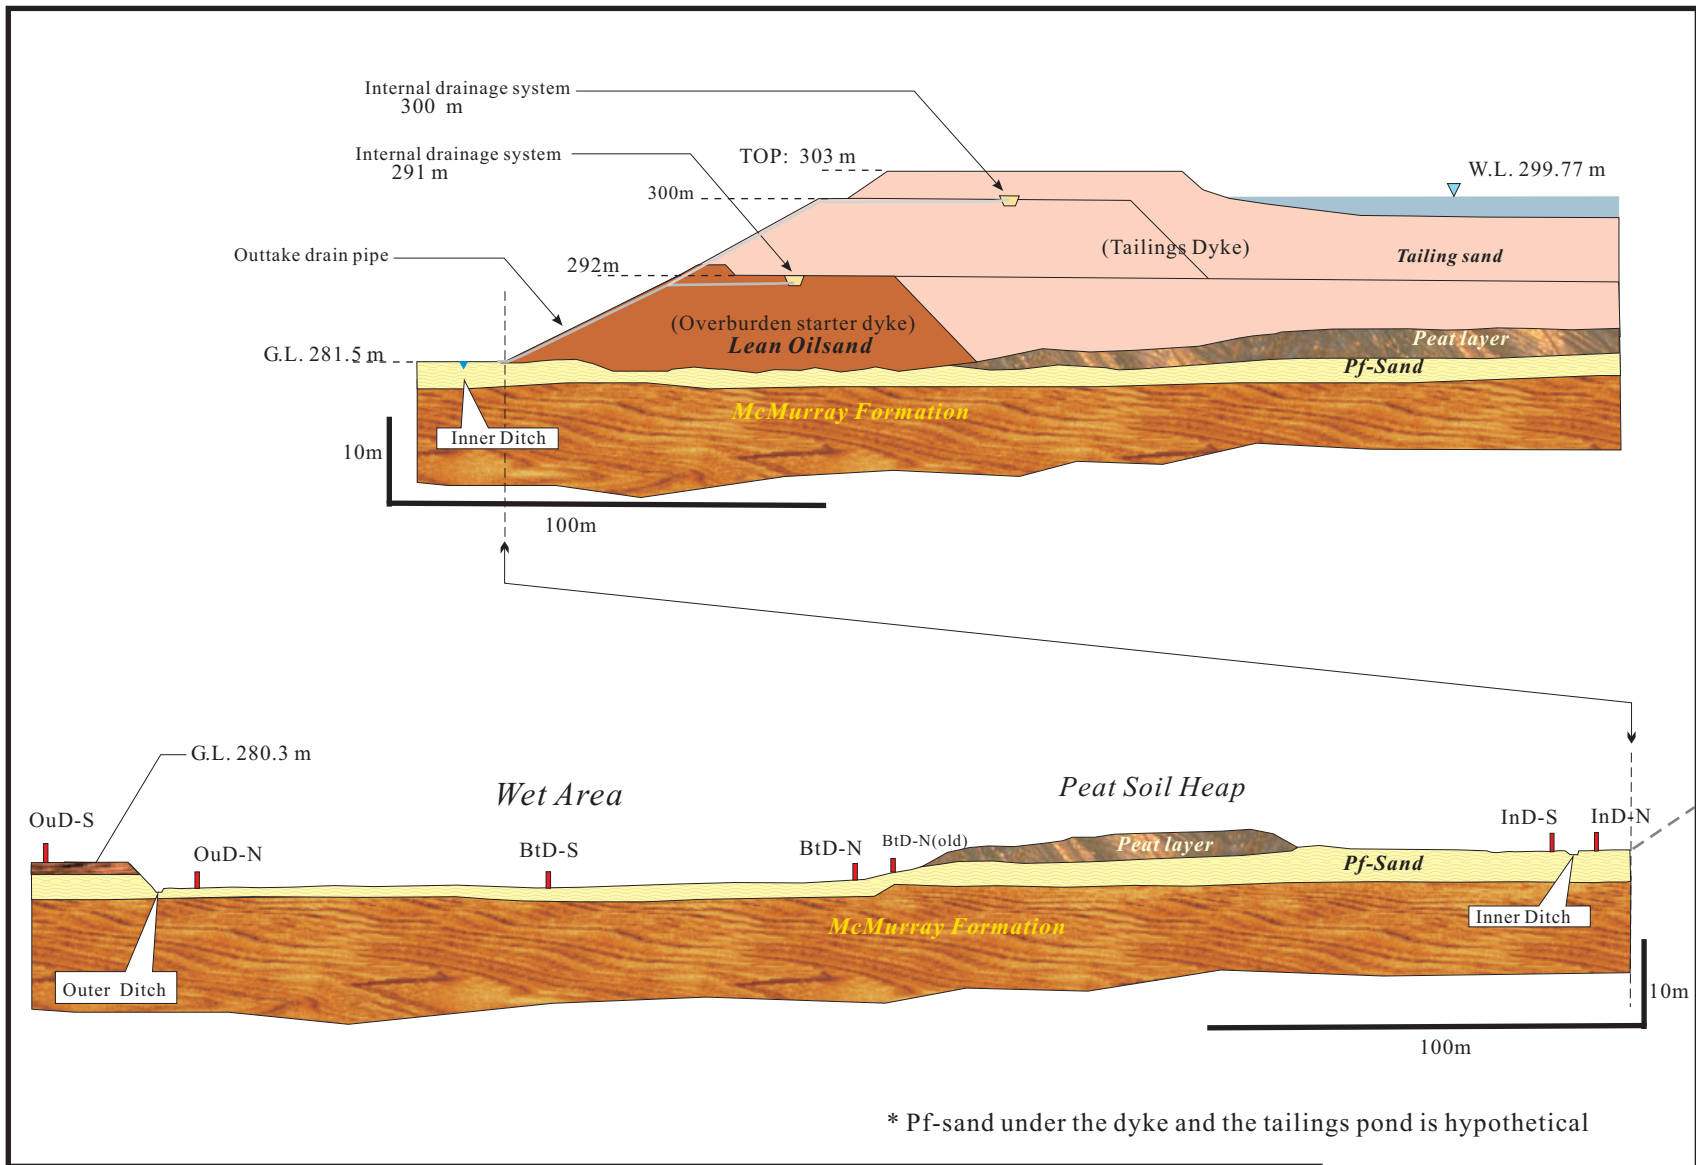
Schematic Cross-Section of the Study Area and the Tailings Dyke
